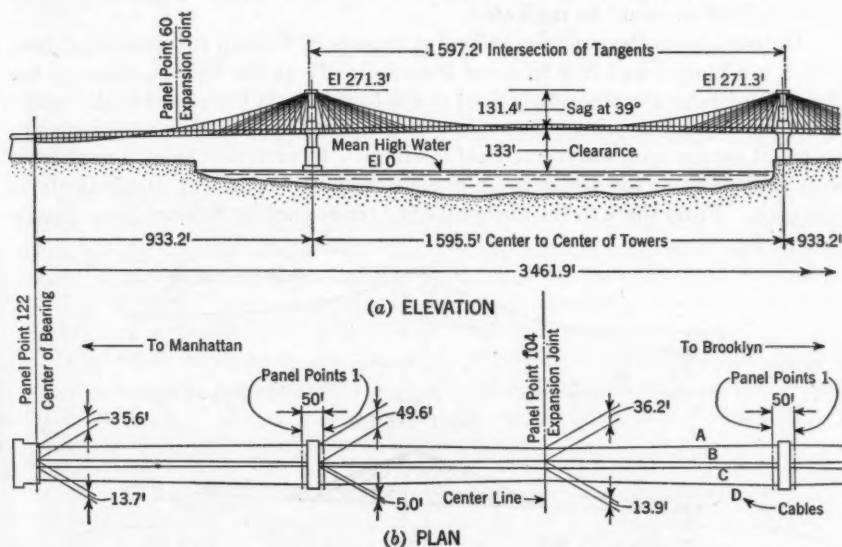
GENERAL PLAN AND ELEVATION, THE BROOKLYN BRIDGE
